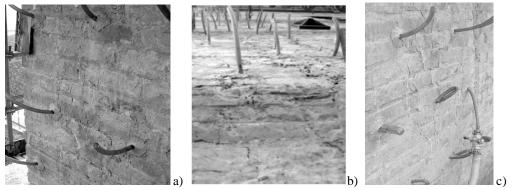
St. Giustina bell-tower. a) presence of diffuse cracking on the South-East corner; application of injections (a) and phases of insertion of reinforcement (b) and of mortar refilling (c).
